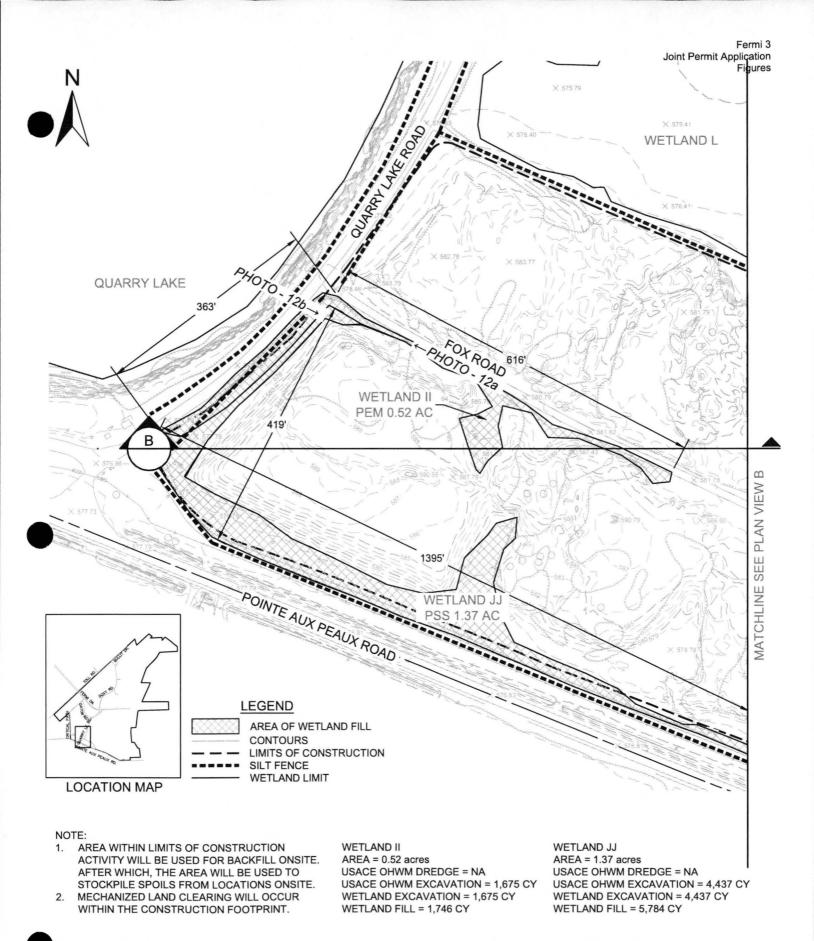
A CONSTRUCTION AREA 1 PLAN VIEW A
